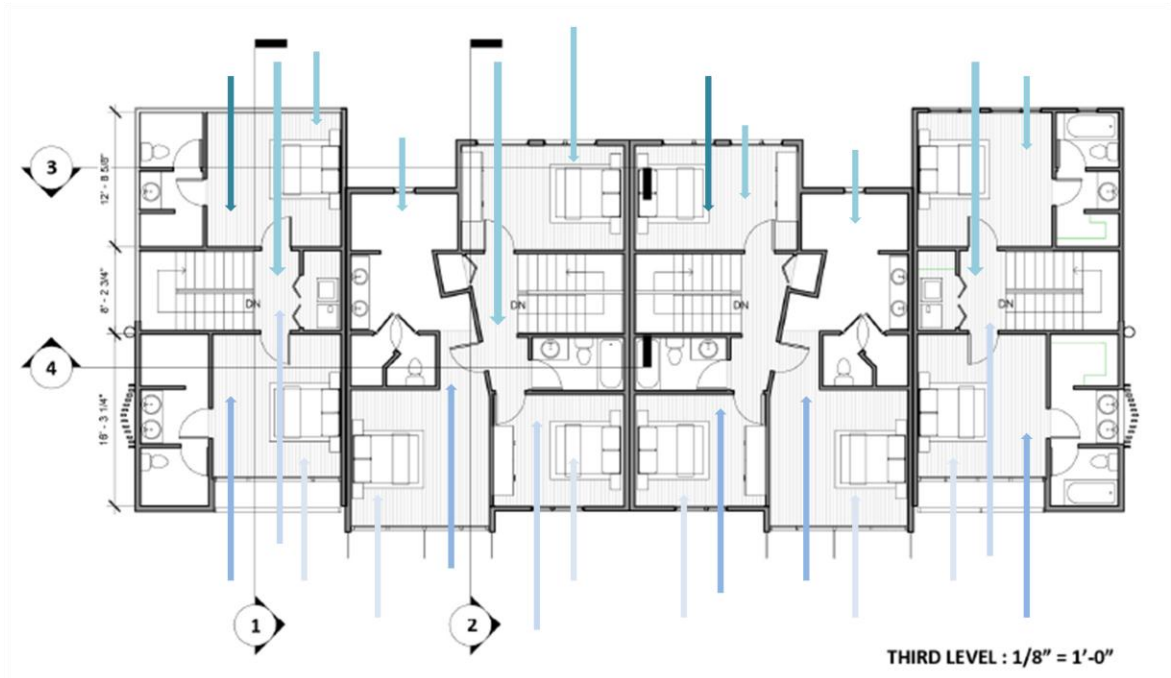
c: Possible manual natural ventilation for the third floor layouts
